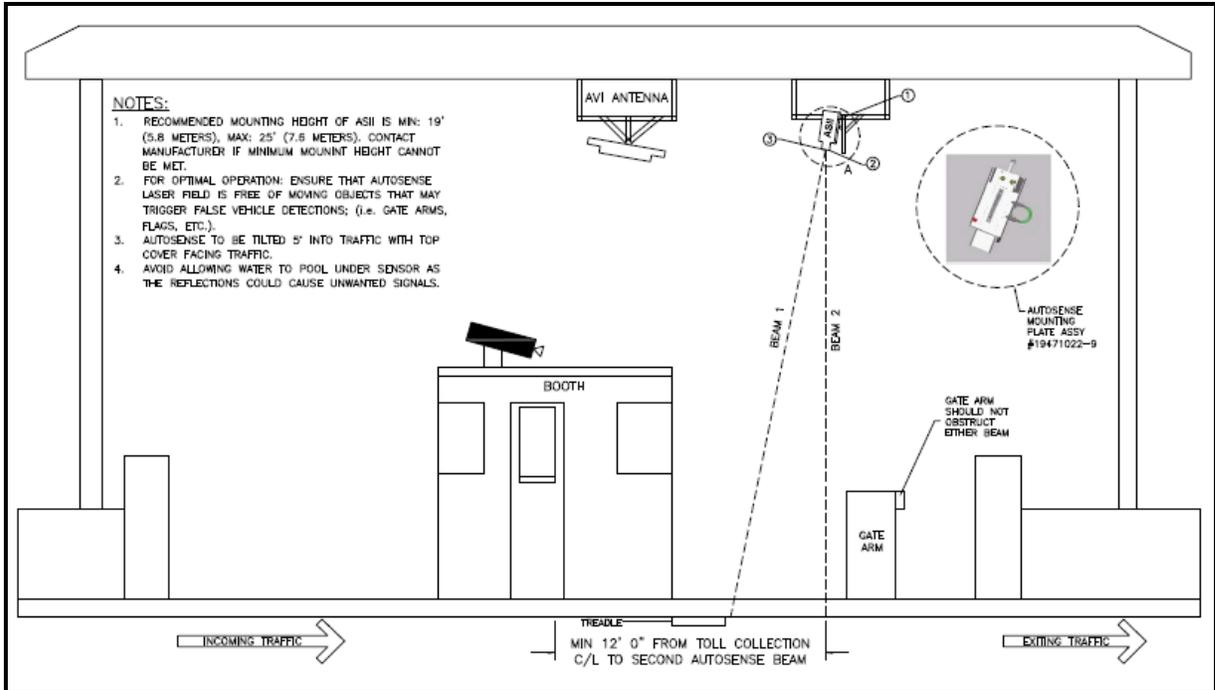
Elevation of Typical AutoSense Toll Plaza Installation
